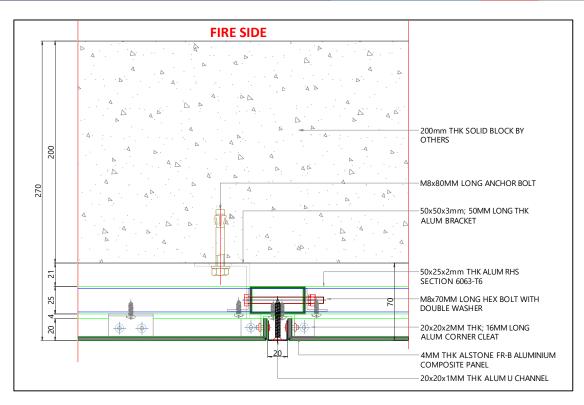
Vertical section detail of the specimen at the ACP horizontal joint. (Drawing provided by sponsor)
